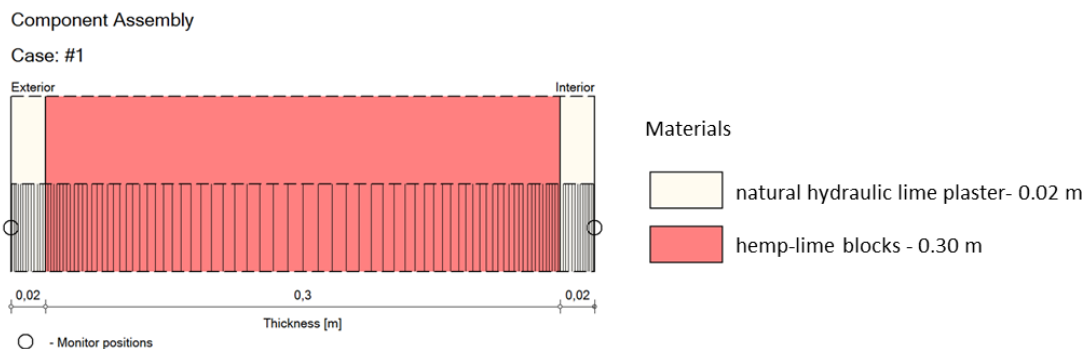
Numerical model of the transversal section of the analysed wall (WUFI® Pro 6.3).
